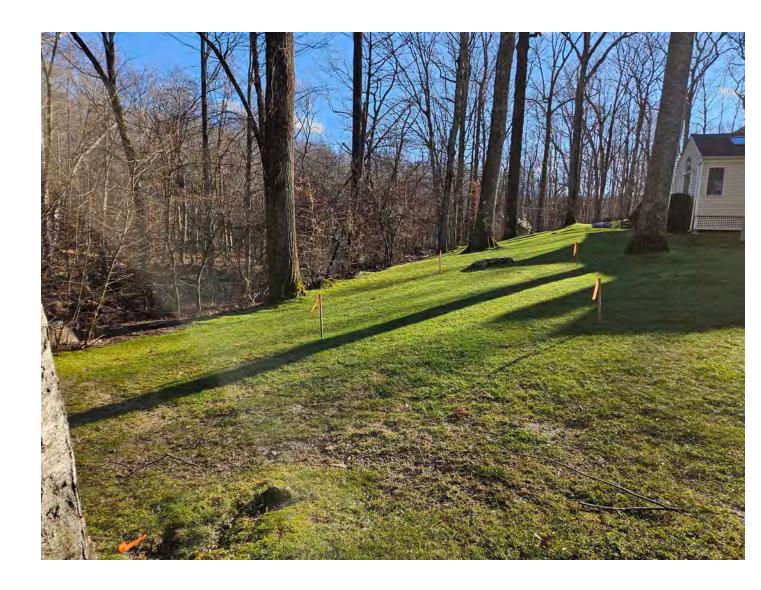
Proposed shed to be located in existing lawn. Looking south. 1/5/24.
